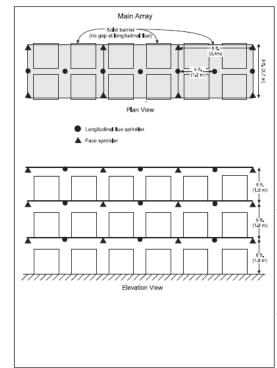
Double row rack sprinkler layout - fire protection scheme D
